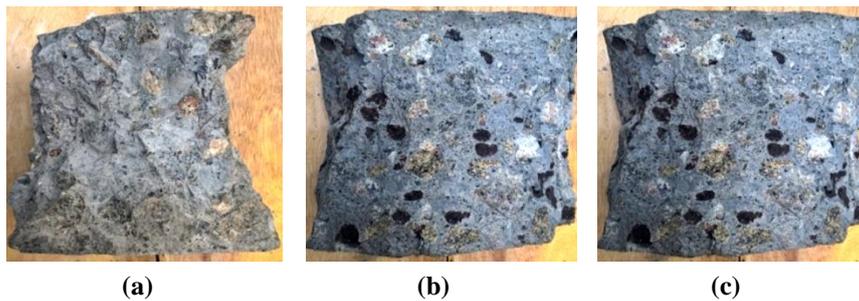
Failure surface of concrete cubes: (a) M0 mix, (b) M2 mix, (c) M4 mix.
